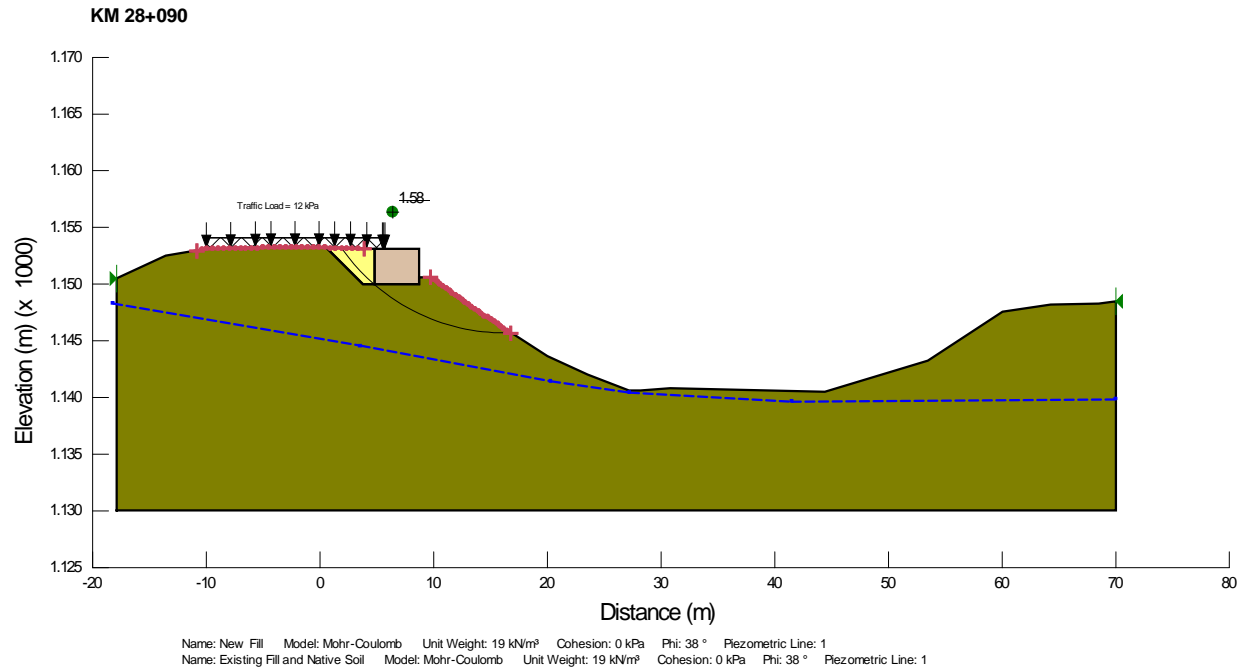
Station 28+090- Local Stability of the Slope after Construction of the Retaining Wall (Retaining Wall Height - 3.1 m, Wall Embedment below Finish Grade - 0.6 m, Reinforcement Length - 3.9 m)
